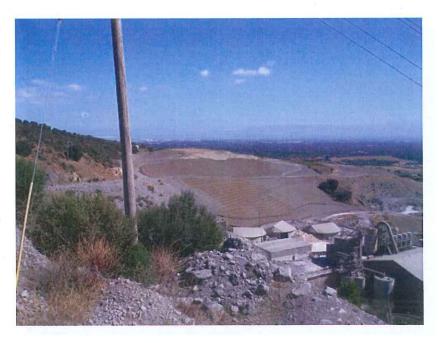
EMSA looking northwest at BMPs installed on finish grade slopes. Dated September 3, 2015
